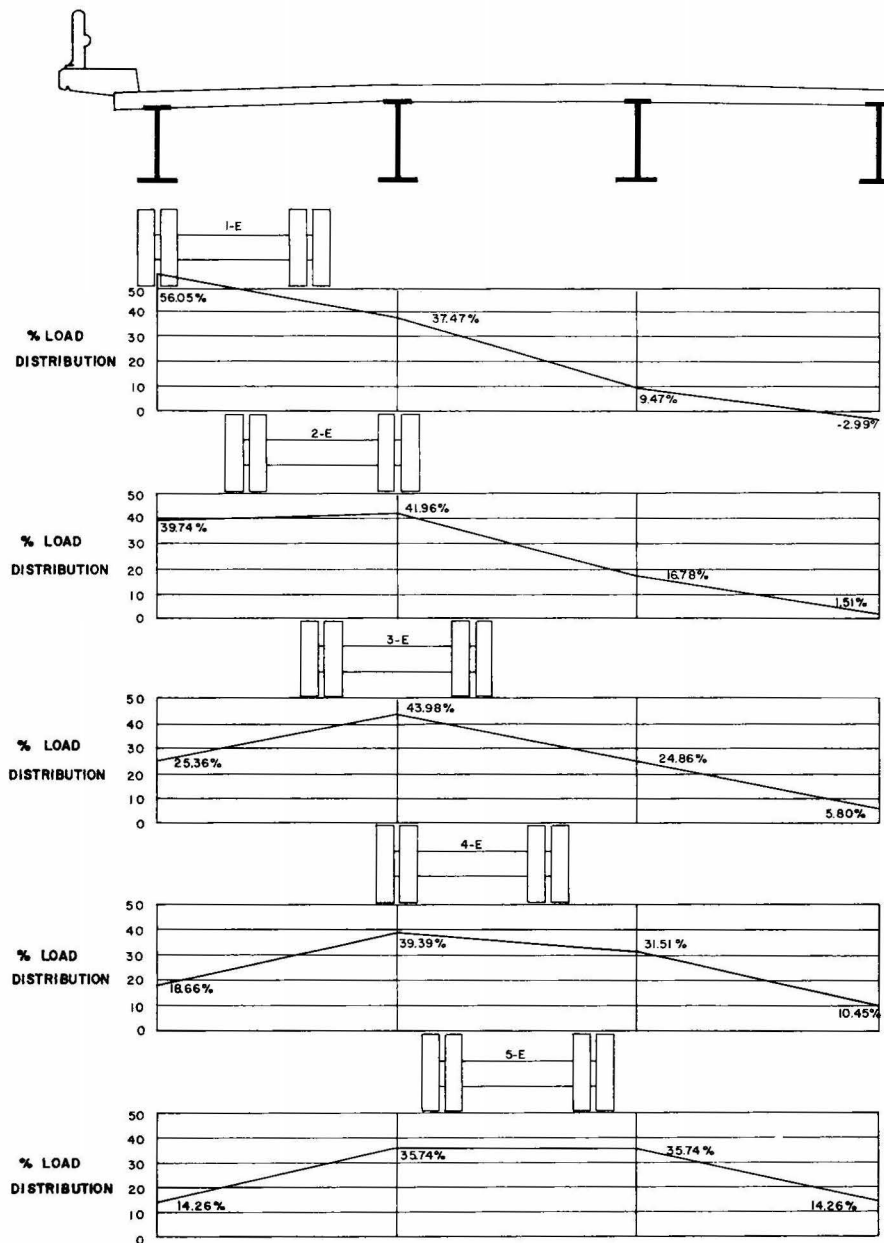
Static load distribution for aluminum stringer bridge at section IV.
